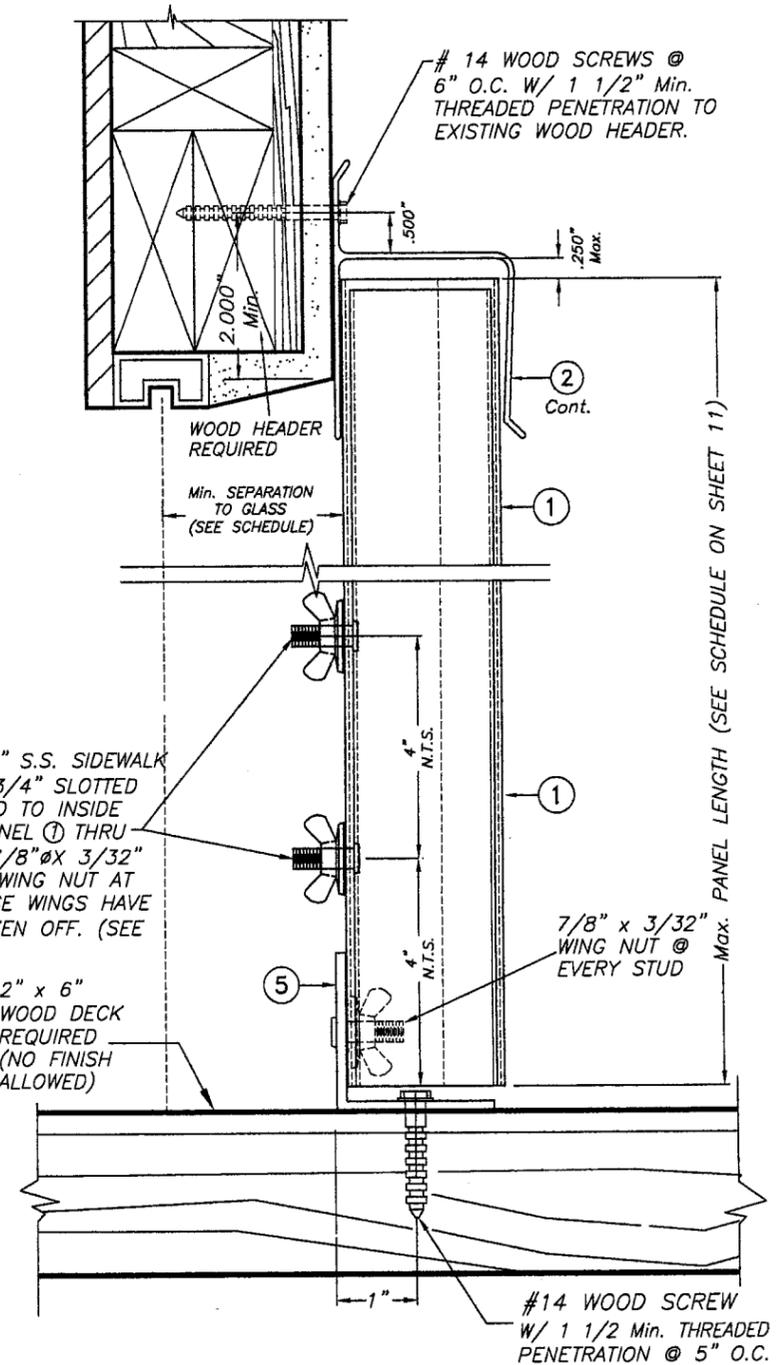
DETAIL X - INSTALLATION OF 1/4"x1" SIDEWALK BOLT @ INSIDE ACCESS PANEL
